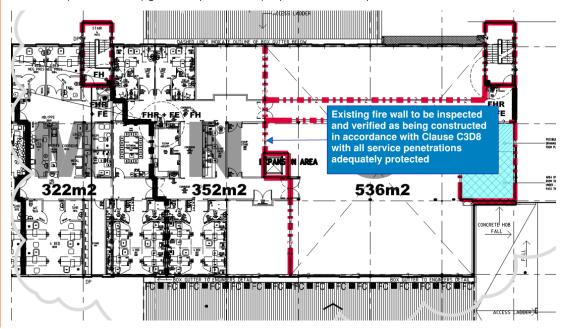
Existing fire wall to be inspected and verified as being constructed in accordance with the DTS
